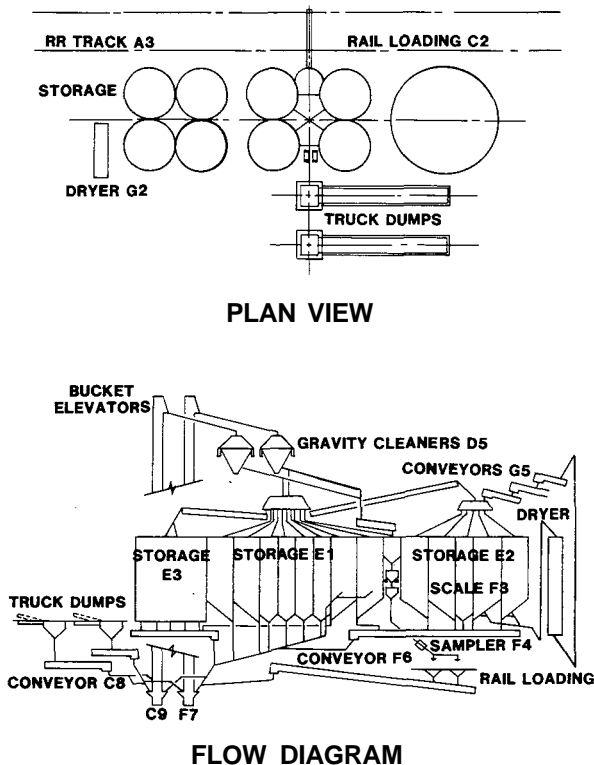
Flow diagram and plan view of 75-car loadout corn-soybean facility.
